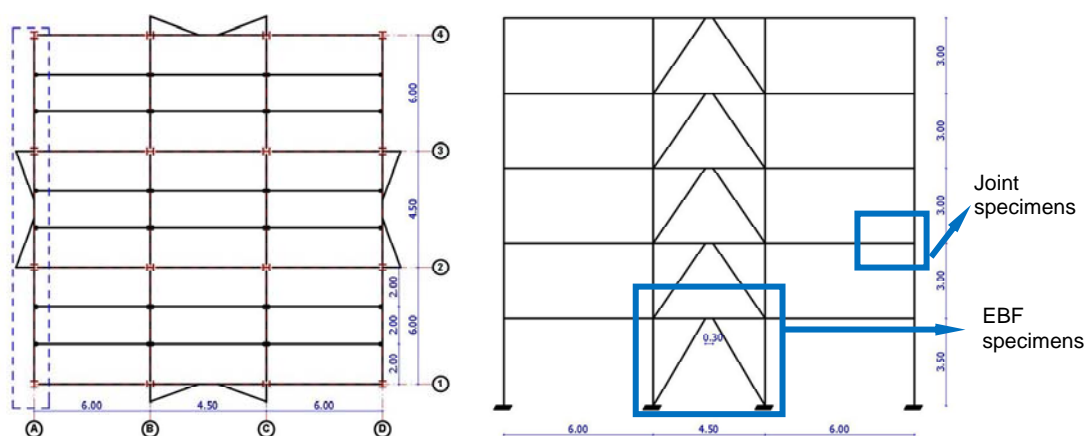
Reference frame used for production of specimens: plan and front views; retrieved specimens
